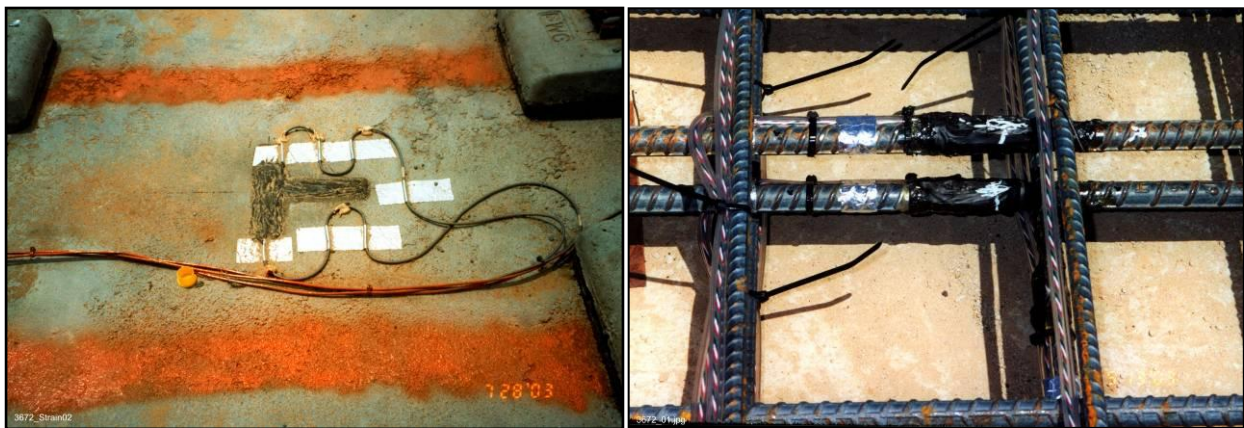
Strain Gages Installed on Slab Surface and Steel Bar
